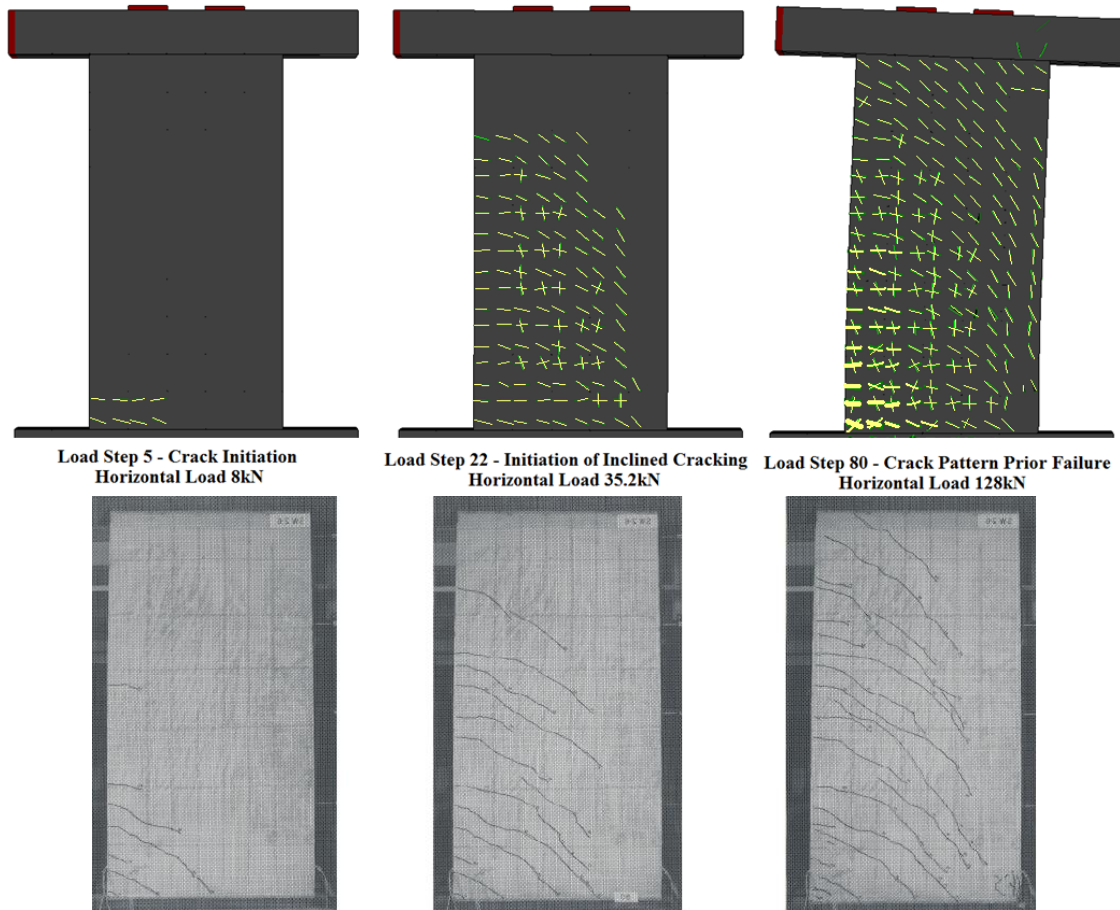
TYPE II RC SHEAR WALL. PREDICTED CRACK PATTERN FOR DIFFERENT LOAD LEVELS OF SPECIMEN SW21 AND EXPERIMENTALLY OBSERVED CRACK PATTERN OF SPECIMEN SW26.
